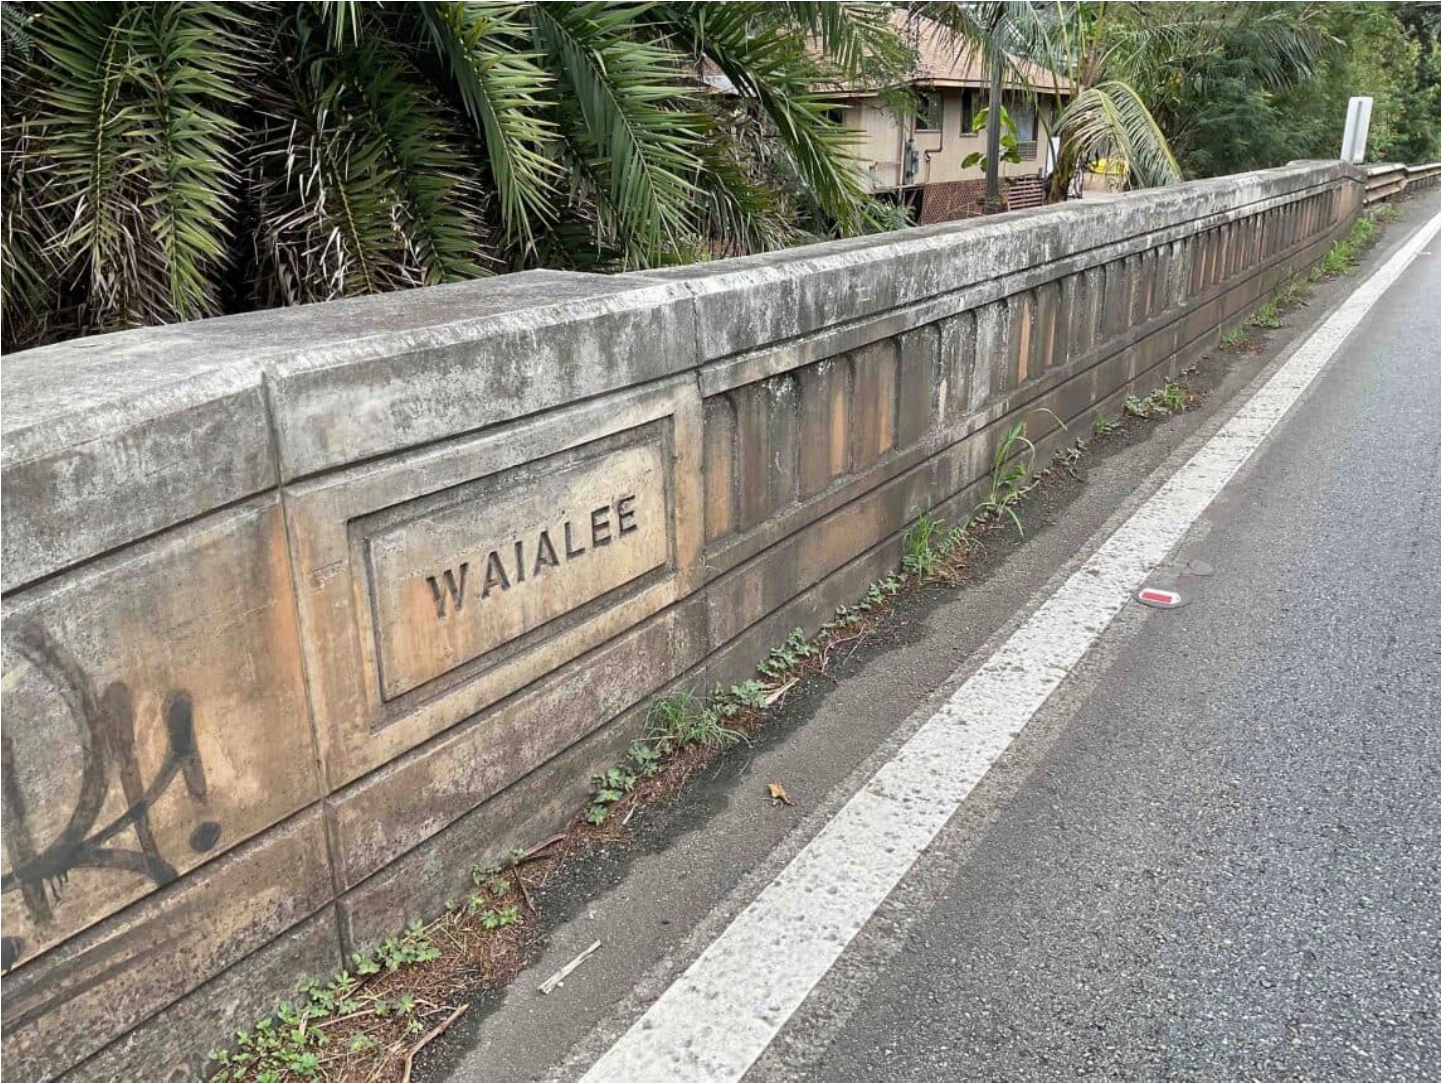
Southeast replacement parapet, facing south. Note bridge name incised on replacement parapet end post.
